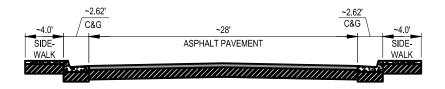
EXISTING AZTEC ROAD TYPICAL SECTION
